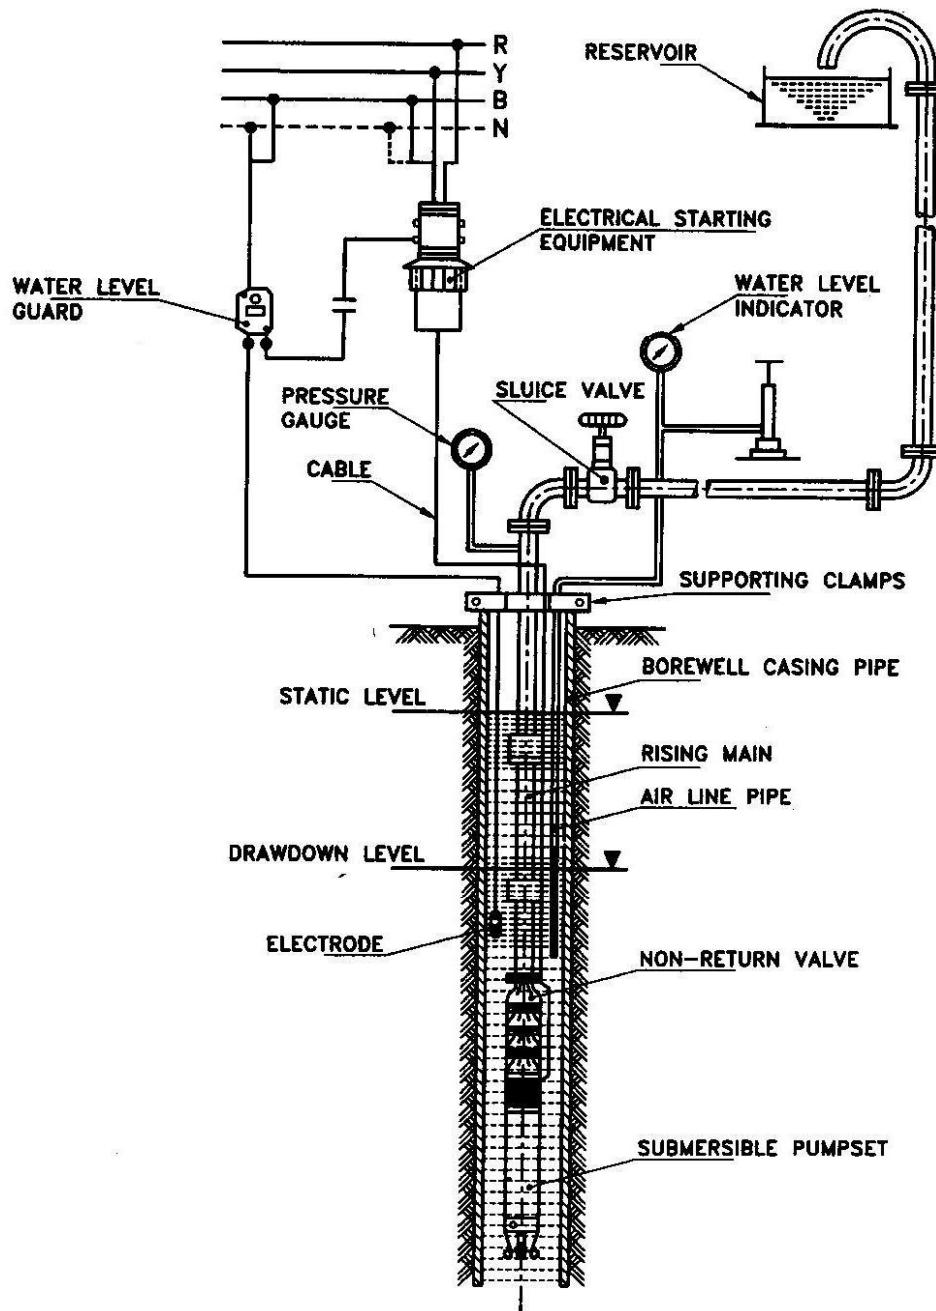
TYPICAL SUBMERSIBLE PUMPSET INSTALLATION
